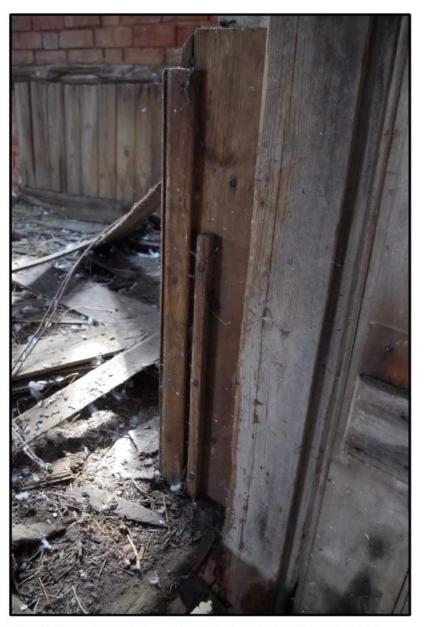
Phase 4 oast house; first floor, hop drying floor; showing groove for removable boards to contain drying hops
